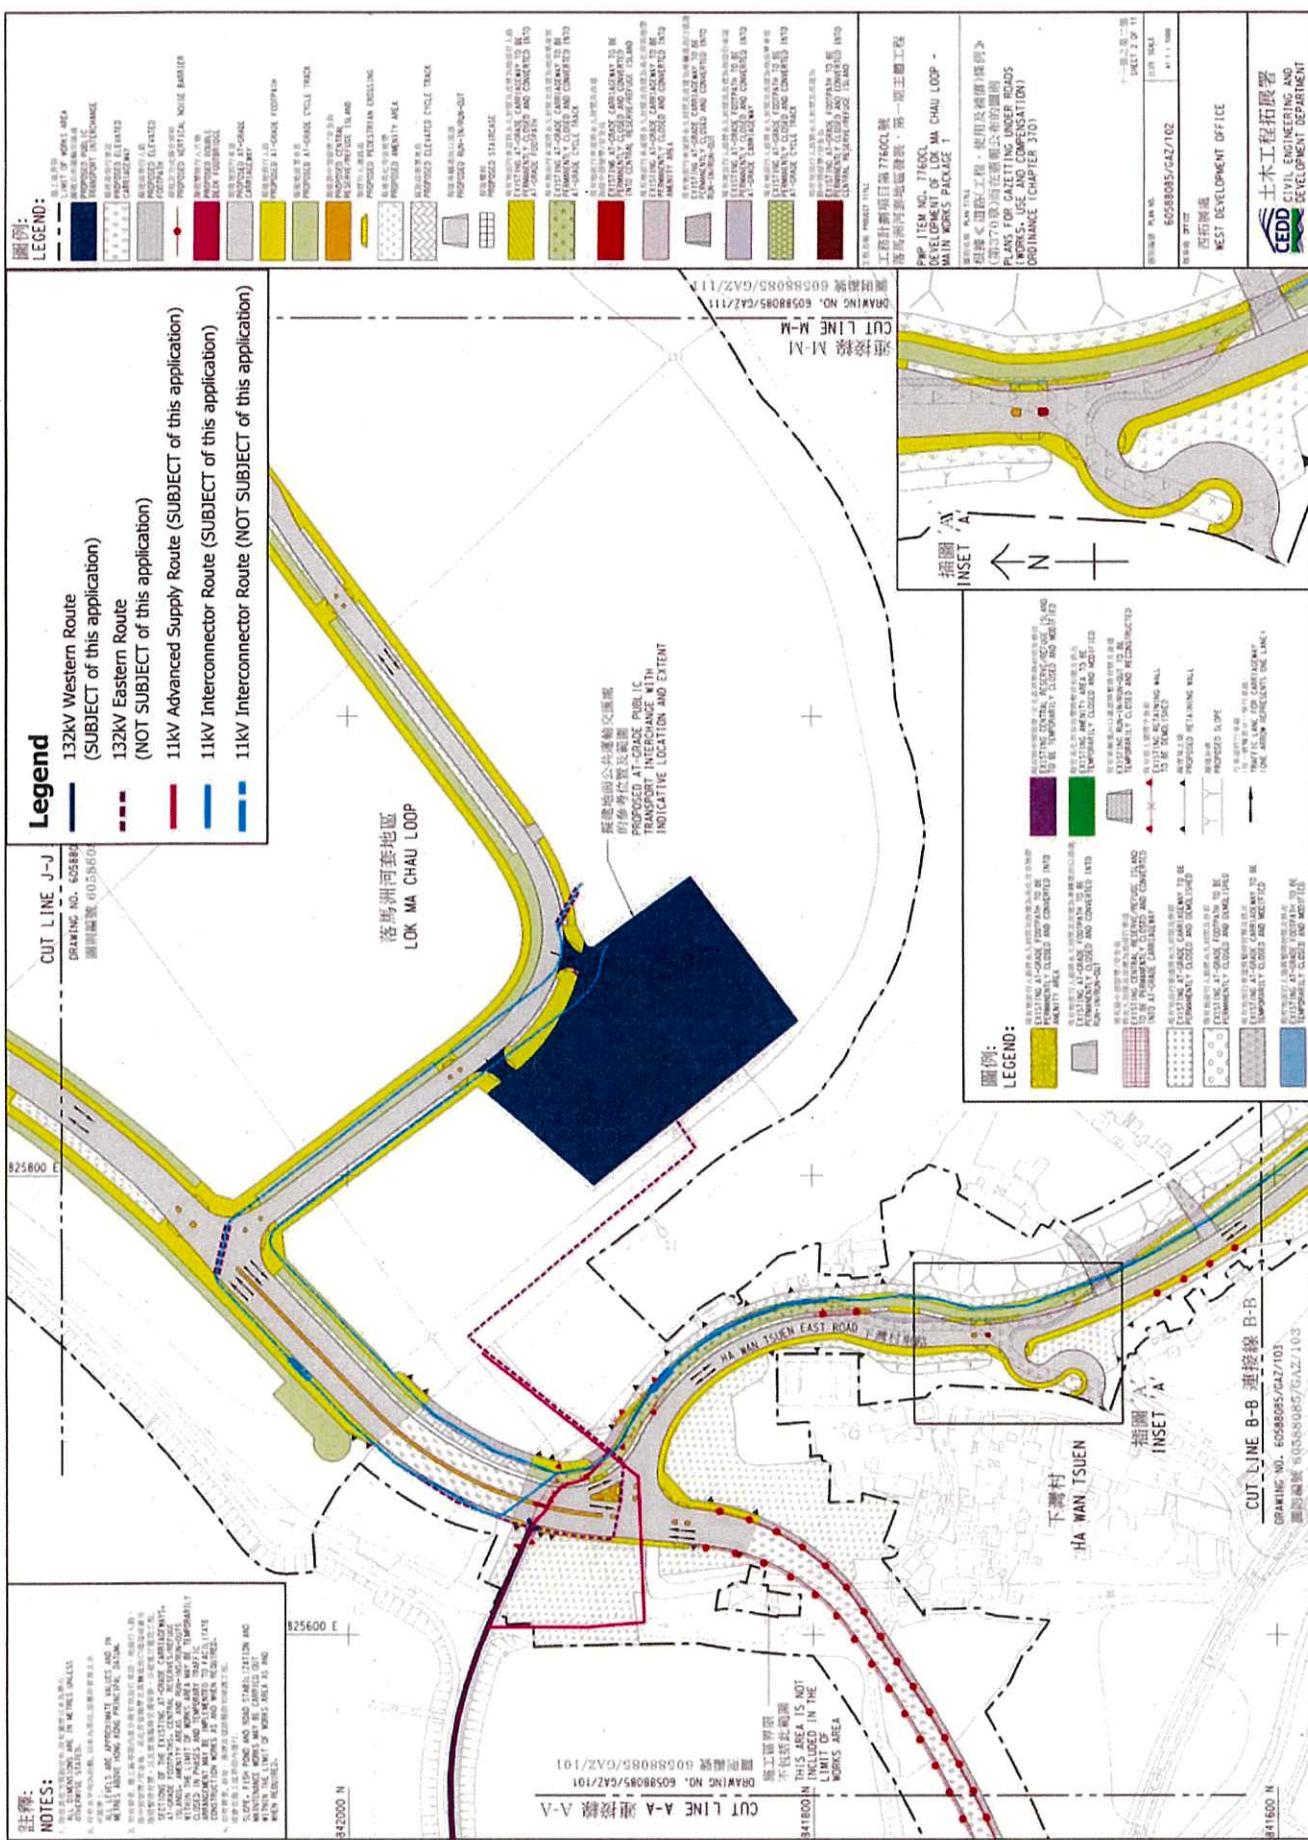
Indicative Alignment of Proposed Cables and Planned Western Connection Road (Source: Gazette Plan: 60588085/GAZ/102 under PWP Item No. 7760CL)
